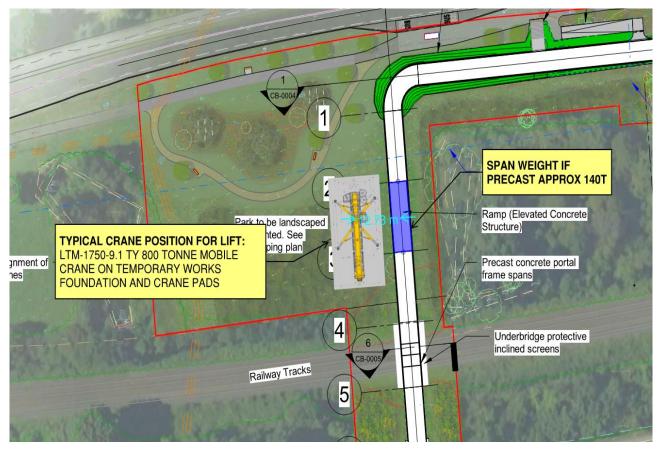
Proposed methodology for erection of north elevated ramp superstructure for precast deck option
